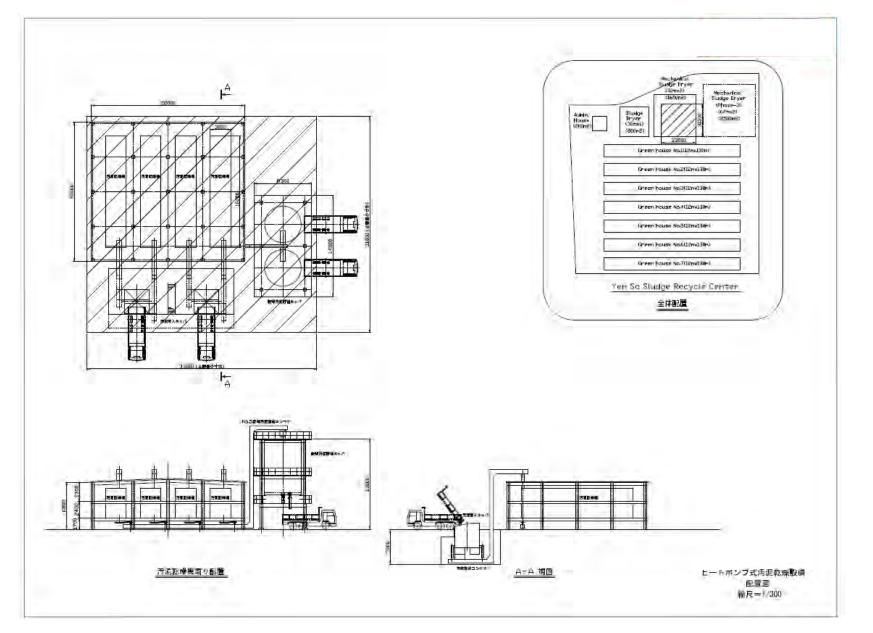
Plot Plan of the Sludge Dryer (Heat Pump Type) (Source: JICA Study Team)
